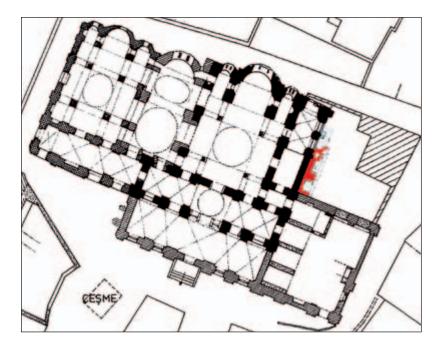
Plan of the Church of the Pantocrator showing the excavation site of the chapel
